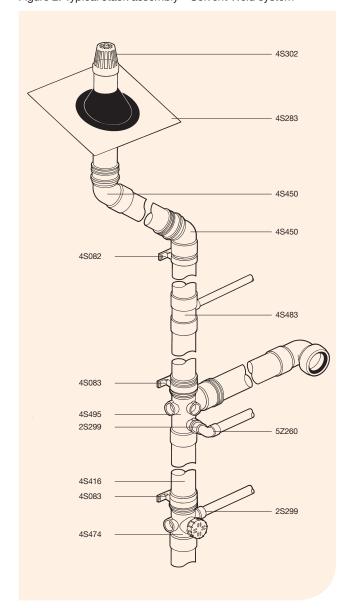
Typical stack assembly – Solvent Weld system
